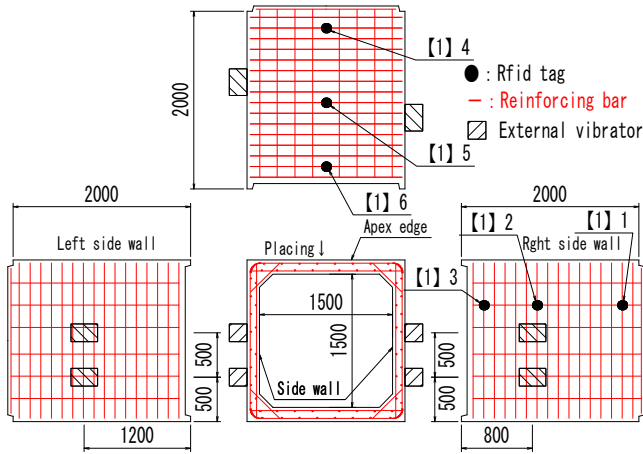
Box culvert (Rfid tag : 【1】 1~6)
